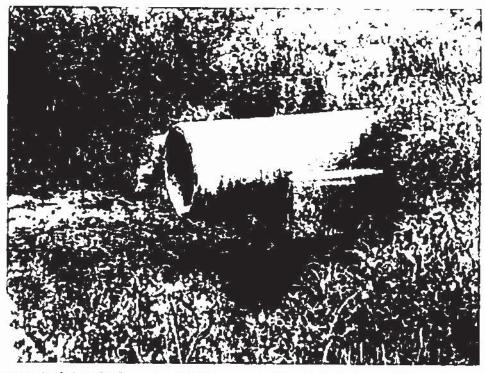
30-inch inside diameter (I.D.) concrete-lined steel pipe outlet and concrete pipe cradle. Spalling of the concrete has left steel exposed around the bottom of the exit. Note thick-brush around the cradle.
